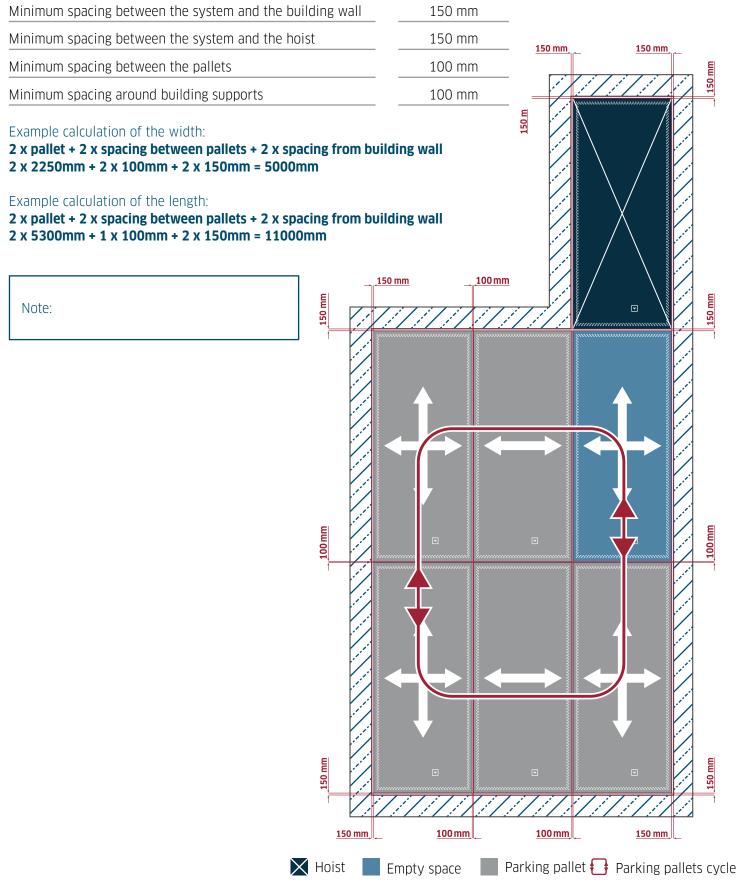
Parking system with five parking spaces (standard pallets) without building supports.
